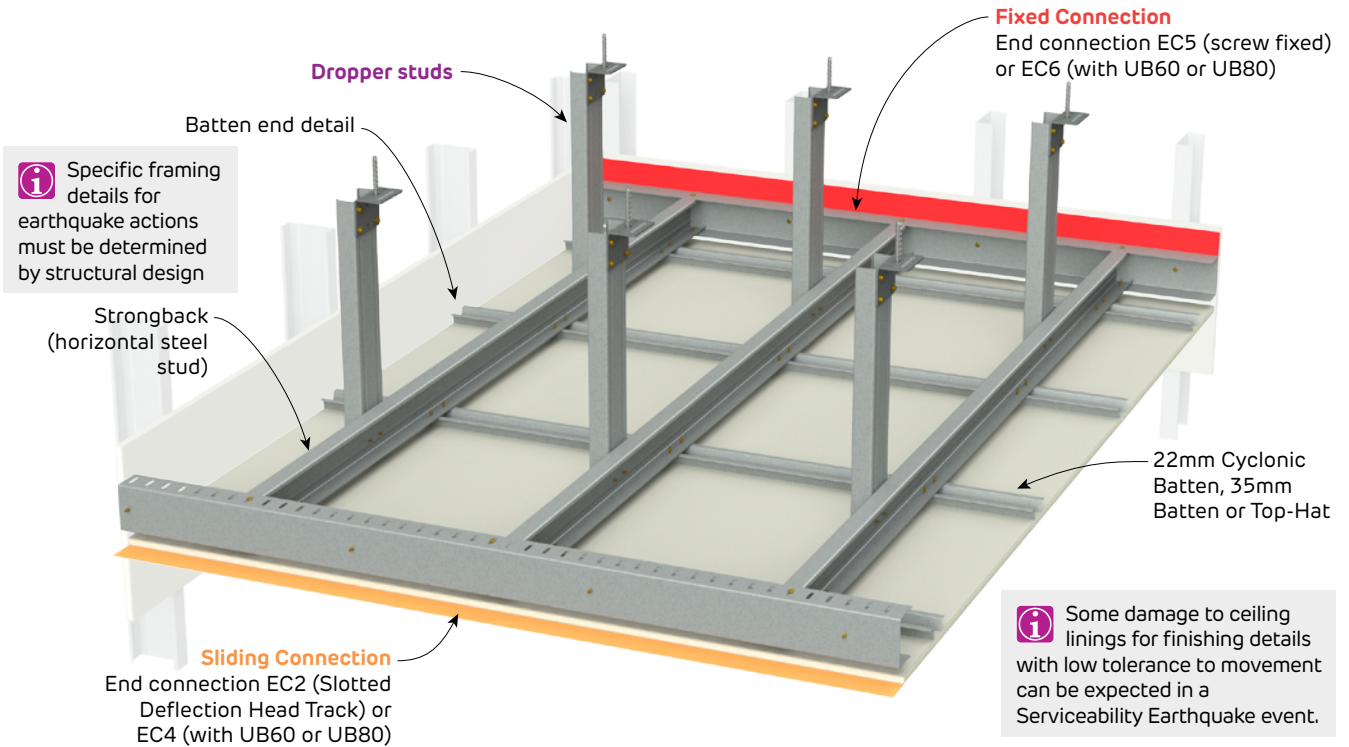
Stud Ceiling Type A3 - Fixed / Sliding
